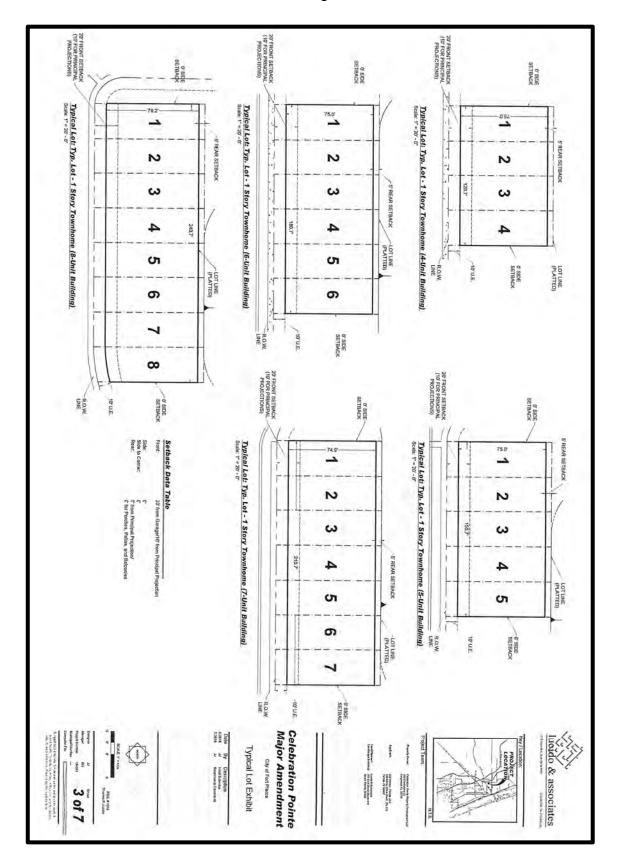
EXHIBIT A Sheet A3 Major Modification to Planned Development Lot 319 Through Lot 610
